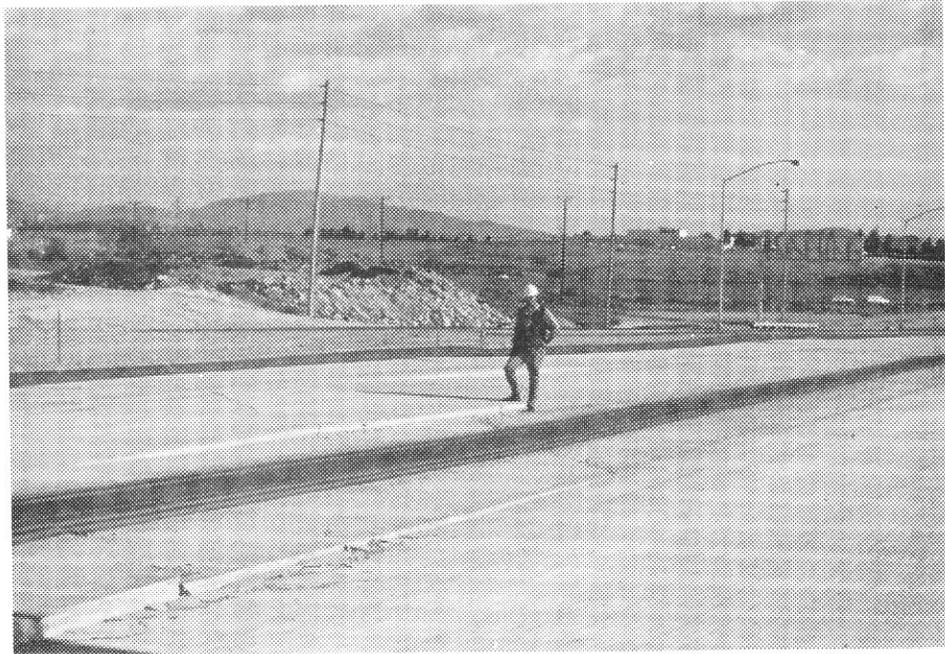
Looking southeasterly at Route 5. Northern flank of Juvenile Hall slide crossed pavement here, resulting in pavement slab movement.
